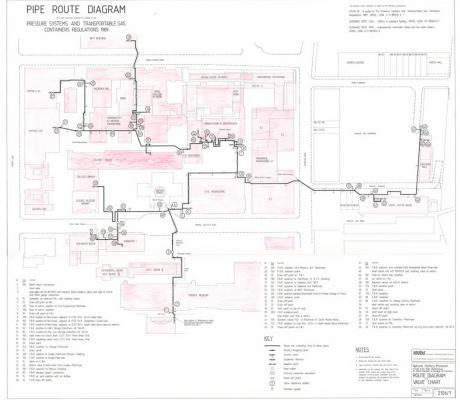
SK ZEN Historical connections between NHM – ScM – V&A (NHM wall drawing)
